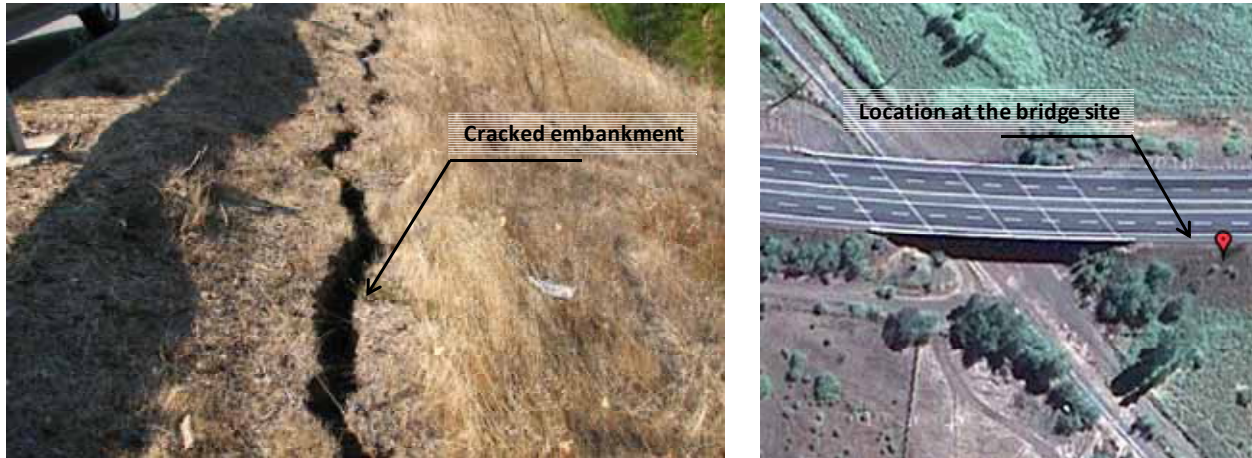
Cracks at the embankment of Perquilauquén Bridge
